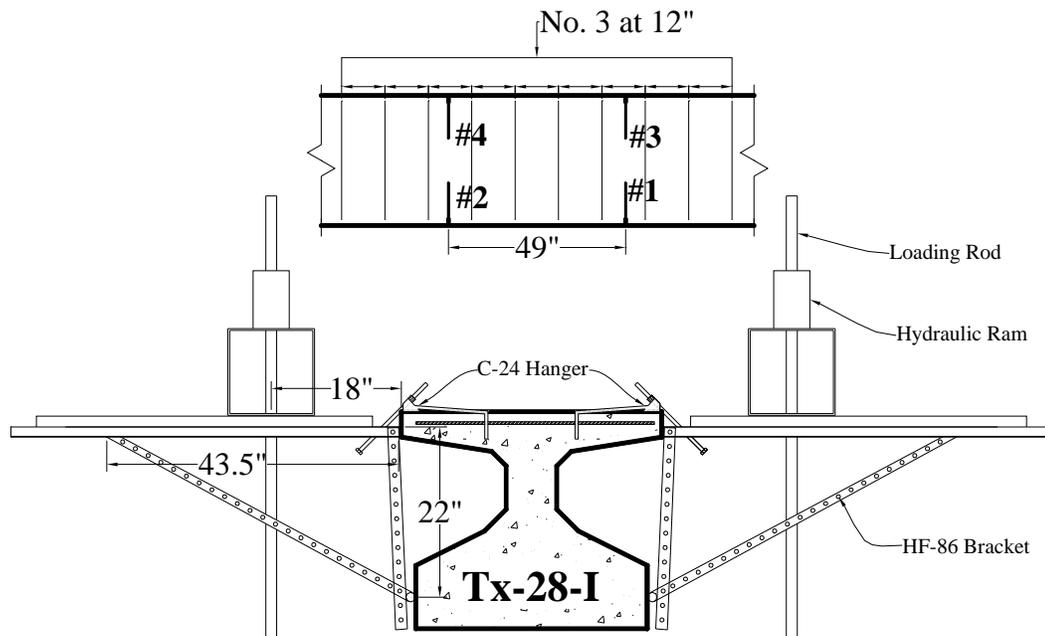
Reinforcement pattern and loading geometry for C-24 on Tx-28-I
